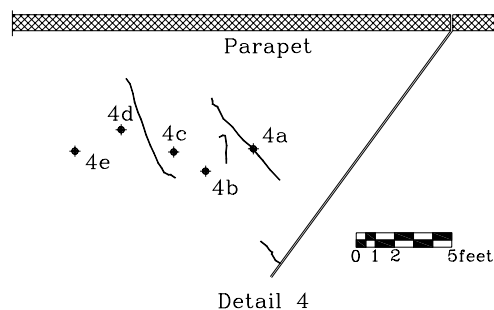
Map of cracks at coring location for Bridge Deck Number 4 (Structure No. S11-82022)
